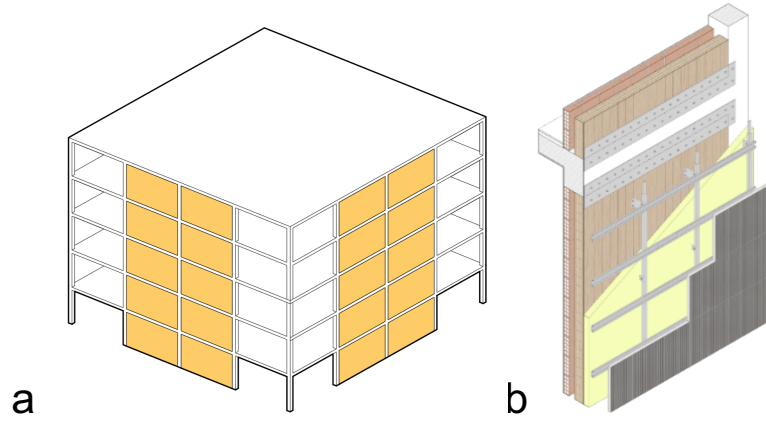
a) An example of building layout with CLT infilled shear walls; b) An example of CLT infill panel with a hooked external skin (ventilated façade) for the integrated seismic and energy retrofit.
